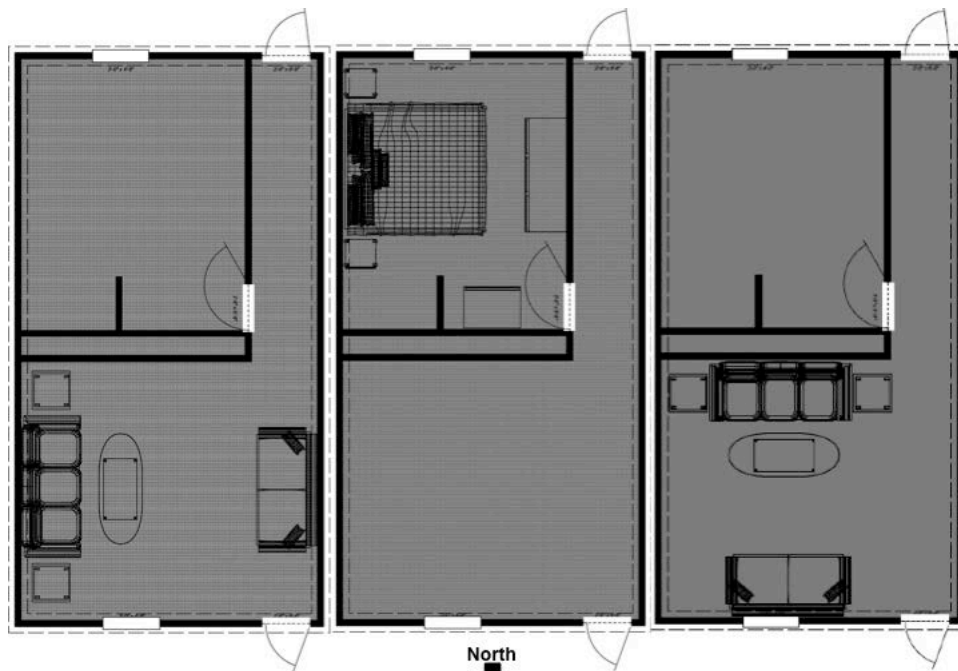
Test Facility Living Room Layout 1 (left); Test Facility Bedroom Layout (center); Test Facility Living Room Layout 2
